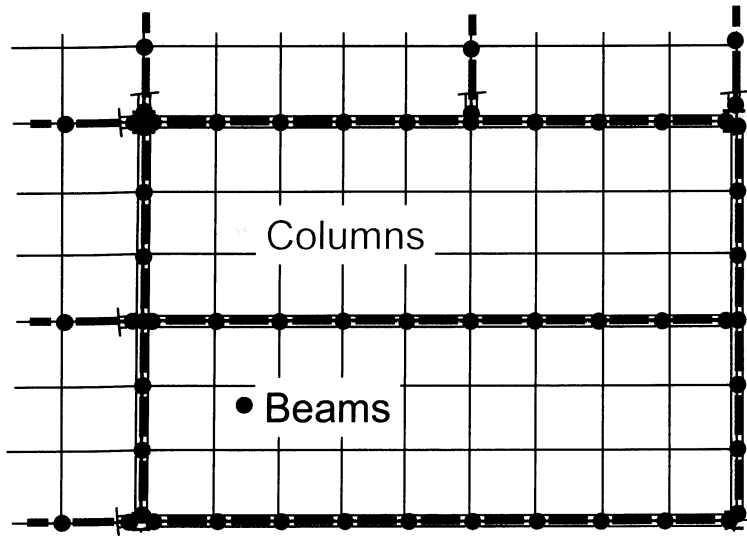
Plan view of corner of typical composite frame showing meshing details
